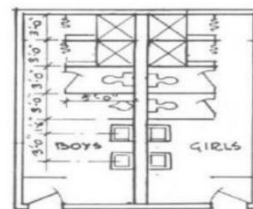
Typical toilet layout. Note back-to-back placement of plumbing fixtures for economy; common plumbing wall for ease of plumbing access; washroom area separate from toilet area for better usage; water closets in separate compartment for privacy; screen of entrance door to shield interior.
